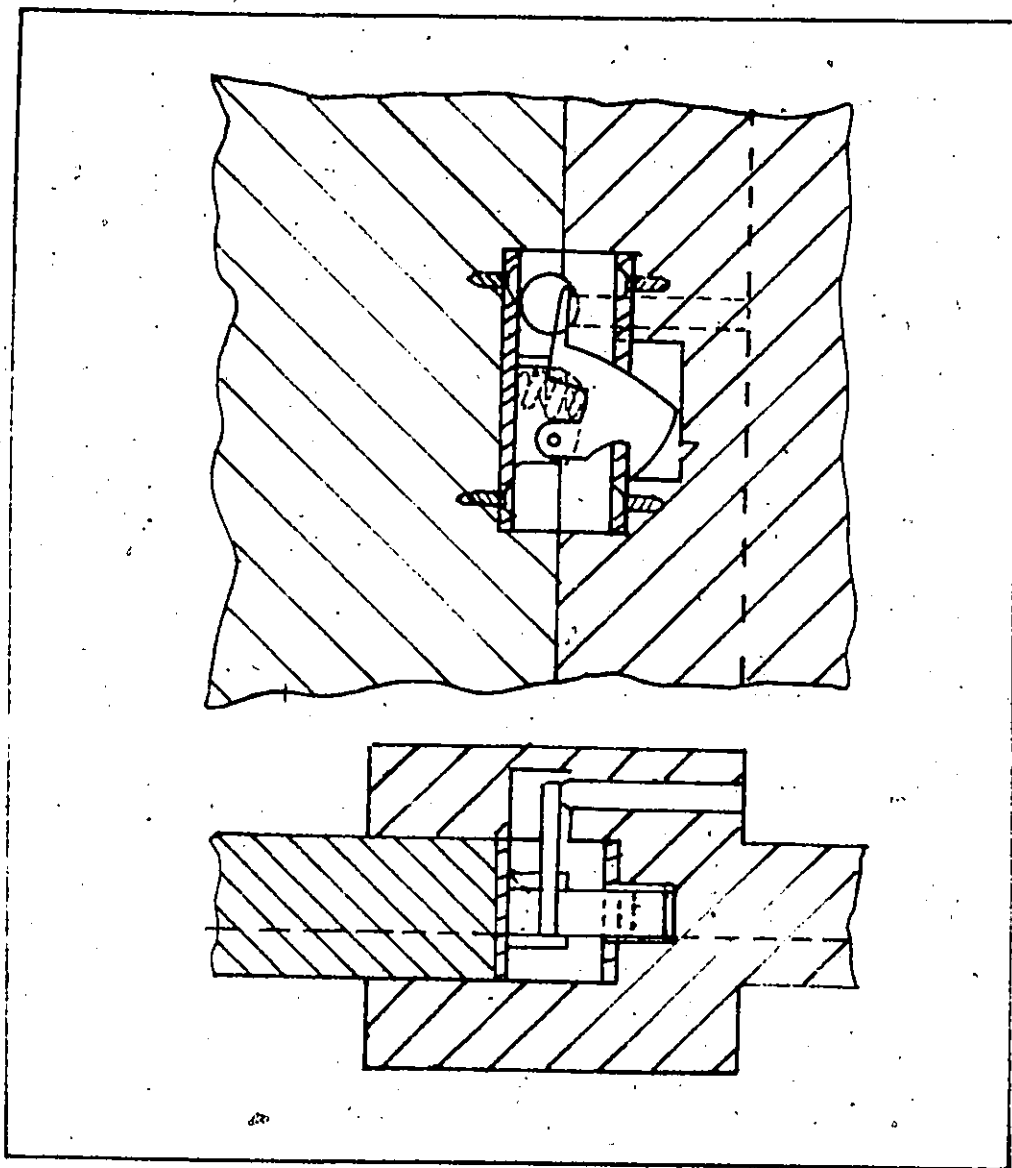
ADAM'S CONNECTION SYSTEM
